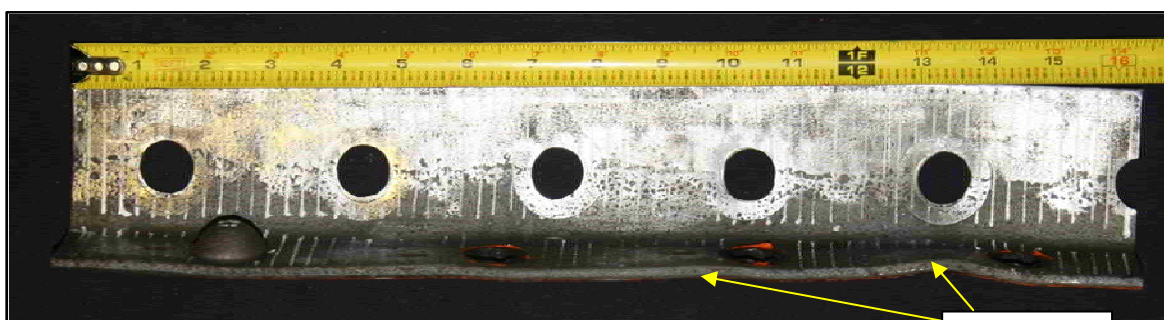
East Angle Riveted Surface – Specimen 4R
